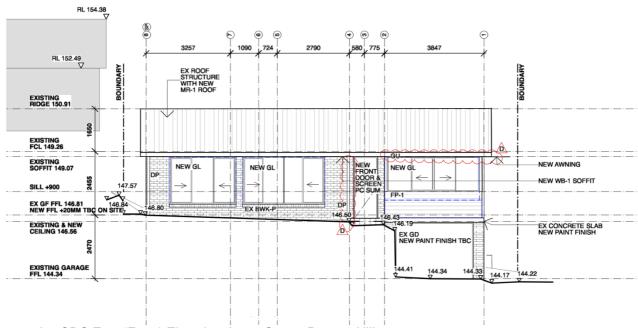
CDC East (Front) Elevation Jones Street, Beacon Hill
